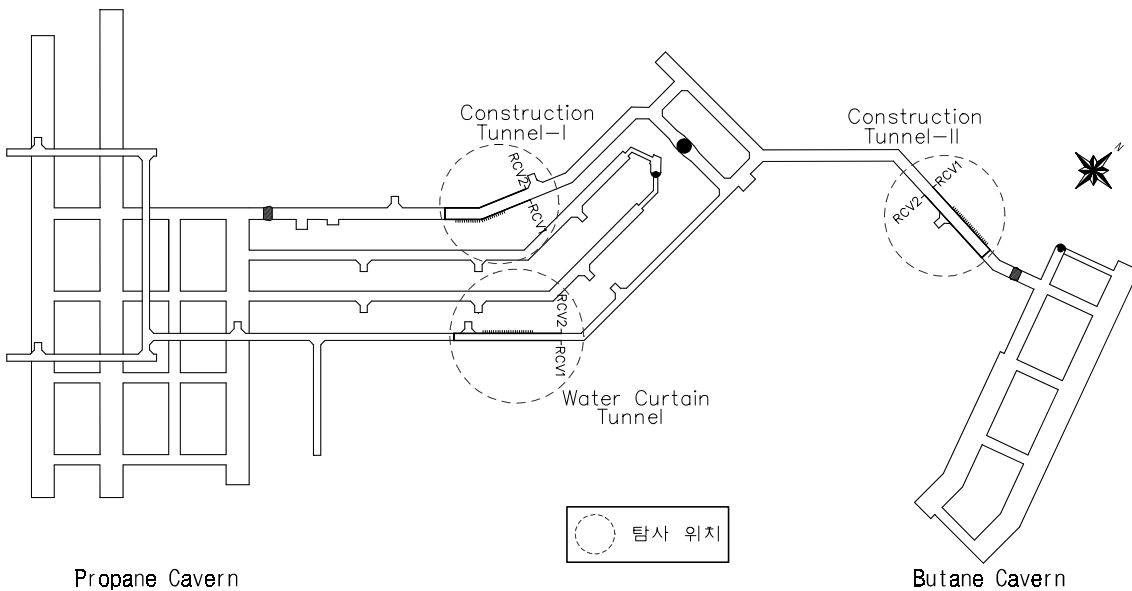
Location map of TSP survey. The survey configurations were arranged in construction tunnel I, construction tunnel II and watercurtain tunnel. The slope of construction tunnel I and II are 10% and 3.9% respectively. Watercurtain tunnel is horizontal.
